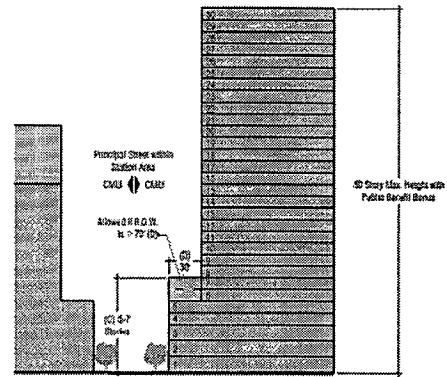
NBG Typical CMU Subdistrict building and street proportions, NBG
